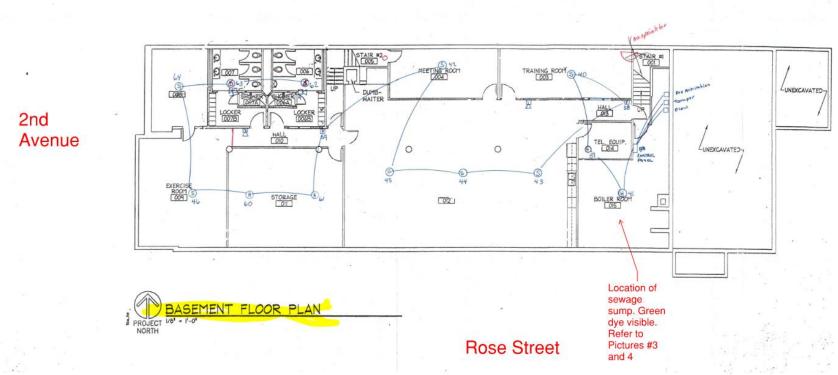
1998 floor plan for the basement floor of the 106 N. 2nd Avenue building and the location of the sewage sump and where dyed water from the janitorial sink was first located (Source: 5/12/1998 Integrus Architecture Mechanical-HVAC Plans)
